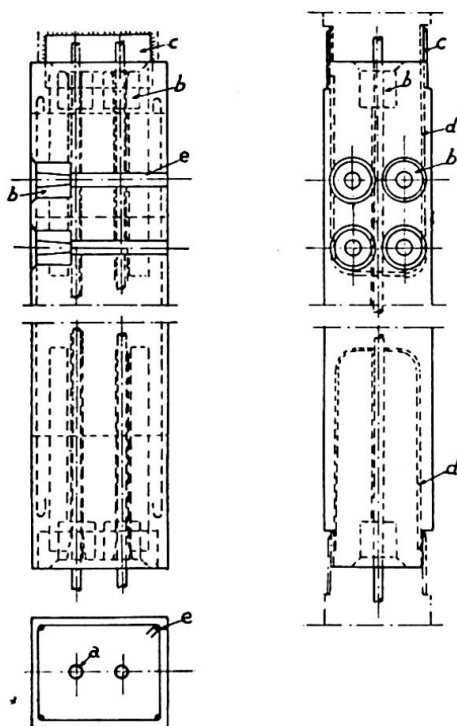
(left). Detail « A » of figure 6 (plan and side elevation).
